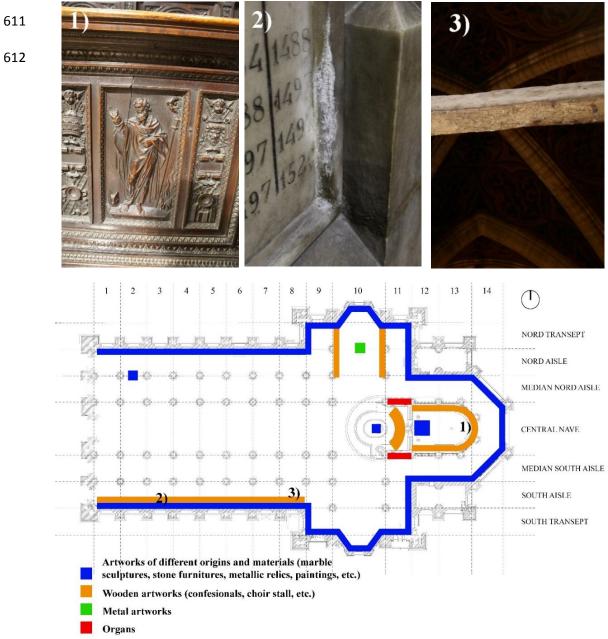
On the left, fissures and cracks found in the wooden stalls 1). In the middle, efflorescence
